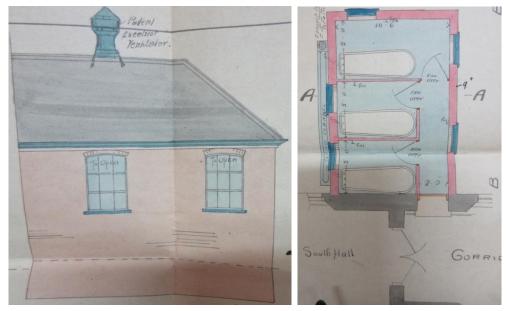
(left): Proposed north-west elevation of new rear extension, 1903. Figure 42 (right): Floor plan of new rear extension, 1903.
